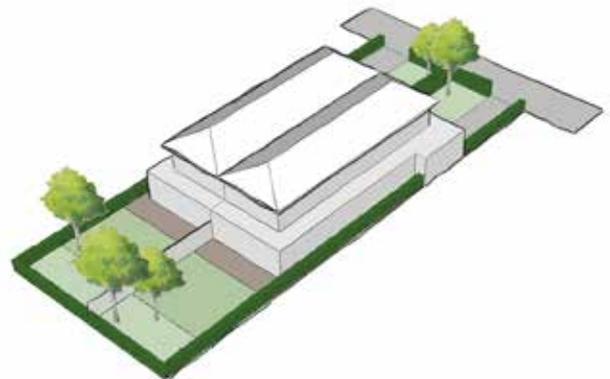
Dual occupancy constructed with the new 35% minimum garden area requirement
